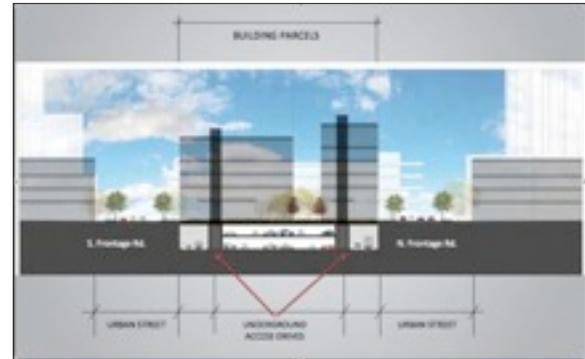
Above, Clough and Harbour Plan, 2006, with underground parking and service lanes.
